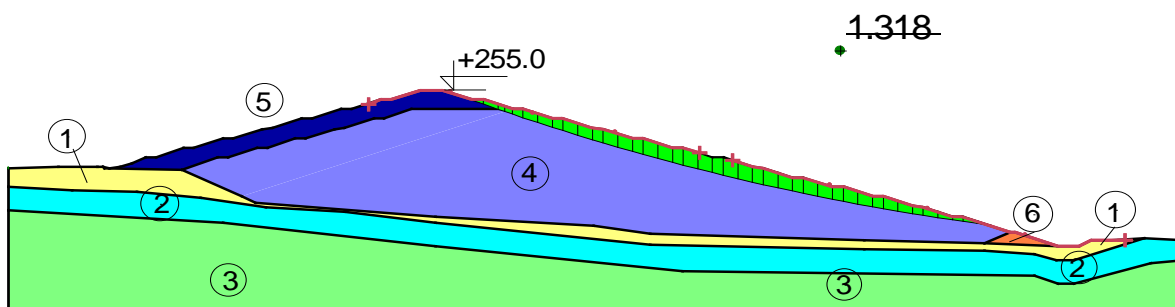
Section 4 - Final phase of landfill construction, situation after the recultivation, pseudo static conditions(Z1), right slope, $F_s=1.318$
